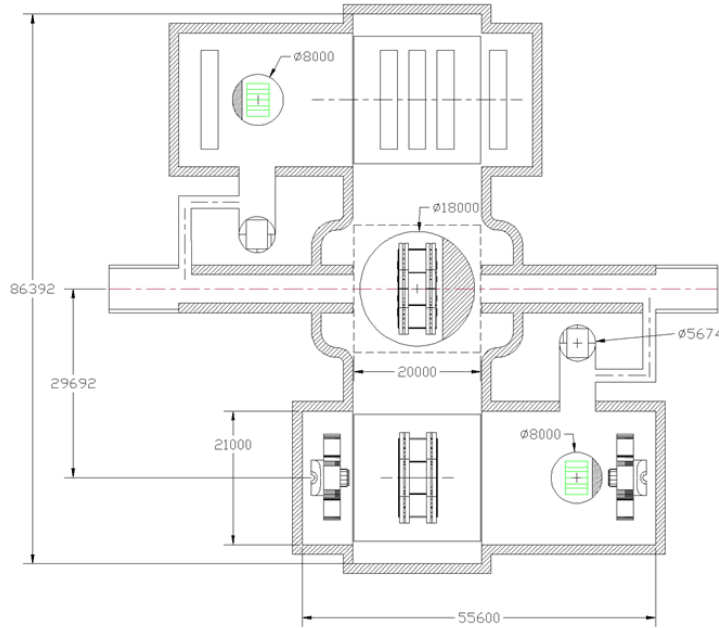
Layout of the IR Hall for vertical access, showing installation shafts and push-pull platforms.
